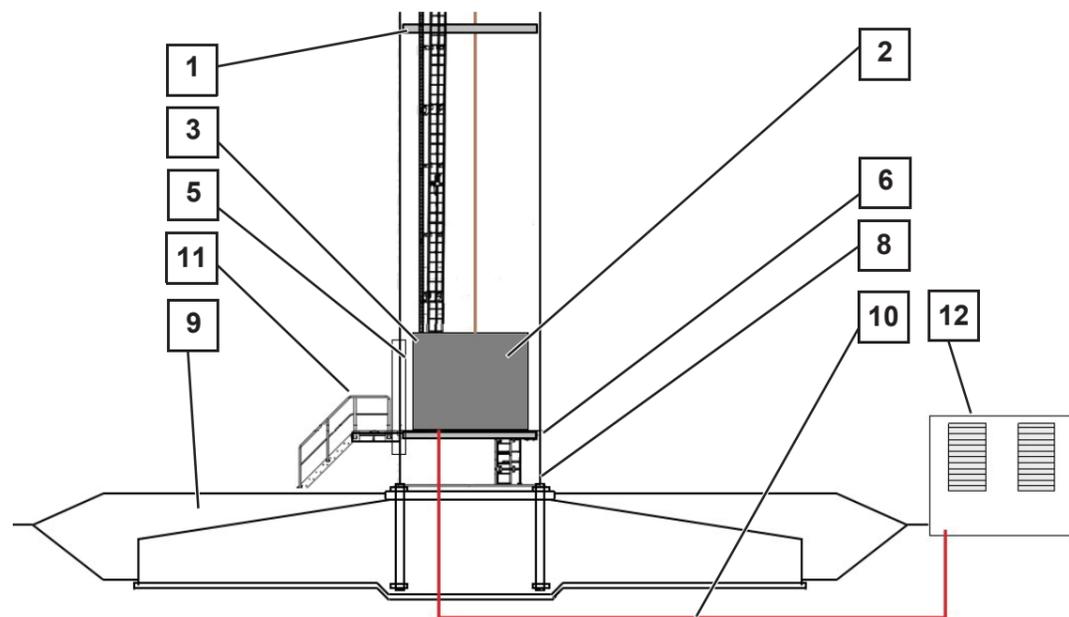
Section through the tower base, variant with transformer outside tower (TAT)
